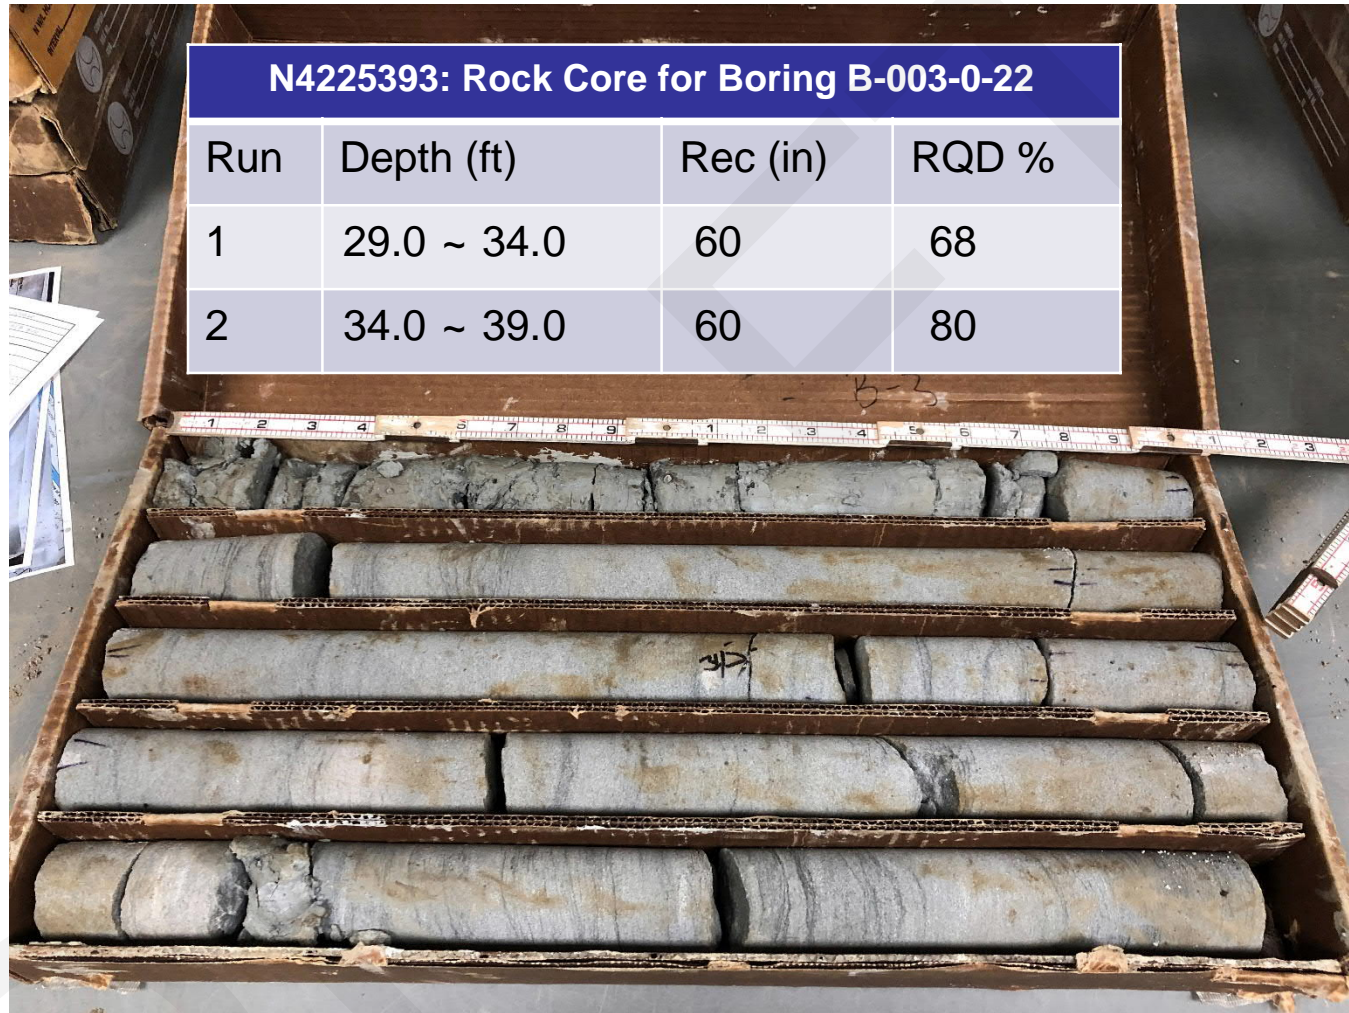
ROCK CORE OF BORING B-003-0-22
